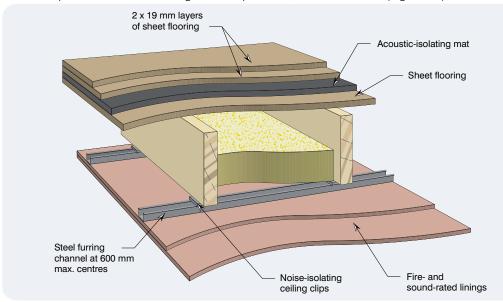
Adding mass to floor system through the use of additional floor sheets.
